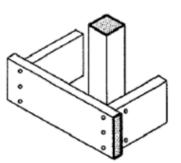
Exterior Connection: Post Screwed to Rim Joist
